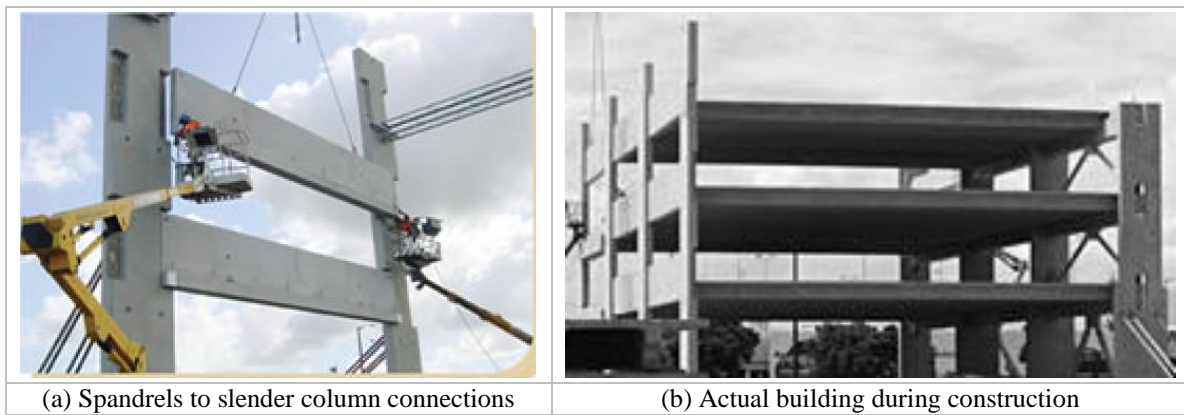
Car parking building using spandrels and slender columns at Auckland Airport [53]
